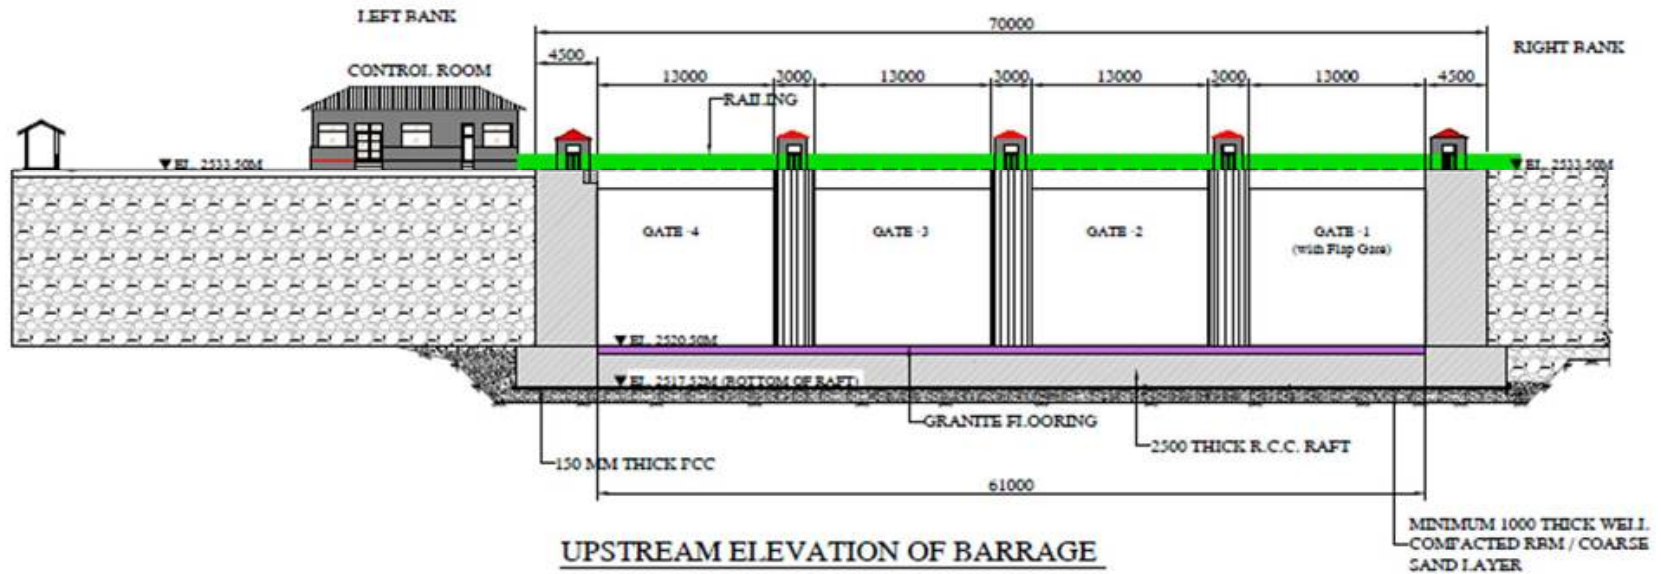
Upstream Elevation of Kuppam Barrage
